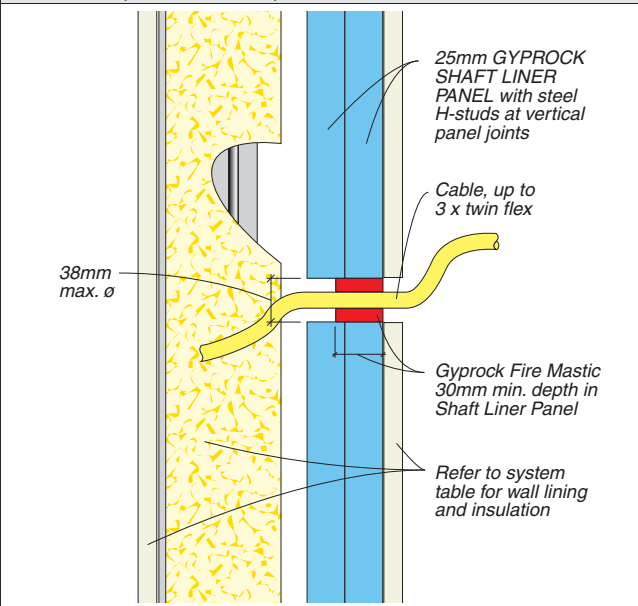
GPO/SWITCH INSTALLATION IN FURRING CHANNEL SIDE WITH PENETRATION THROUGH FIRE WALL (FRL -/120/90)
